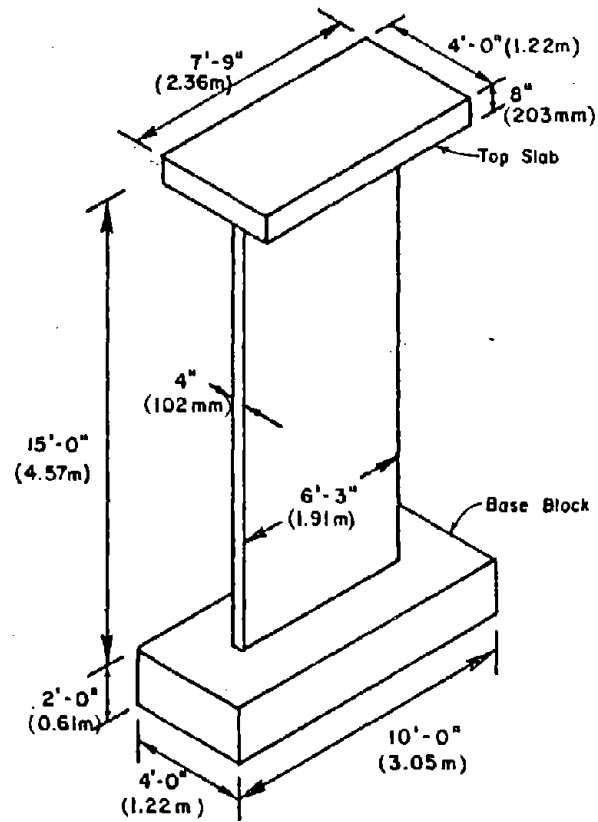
Nominal Dimensions of Test Specimen with Rectangular Cross Section
